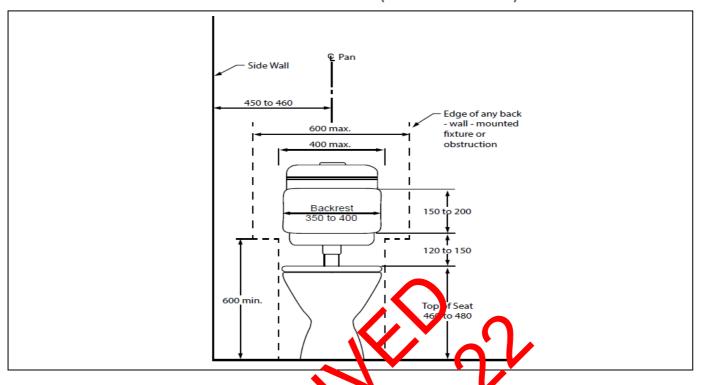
WATER CLOSET INSTALLATION SINE NEW (SOURCE: AS 1428.1)
